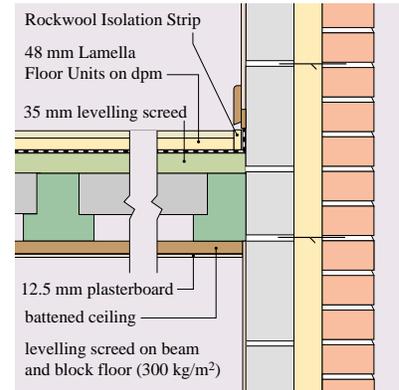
Beam and block floor using Rockwool Lamella Floor Units
